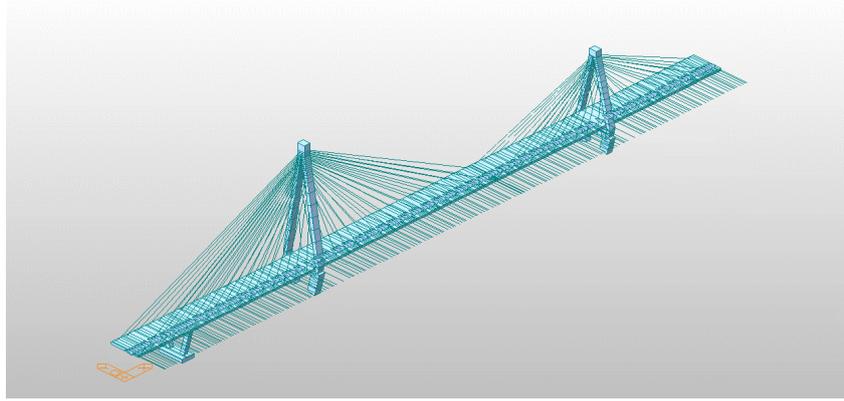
Transverse Wind Load on Cable Stayed Bridge.
